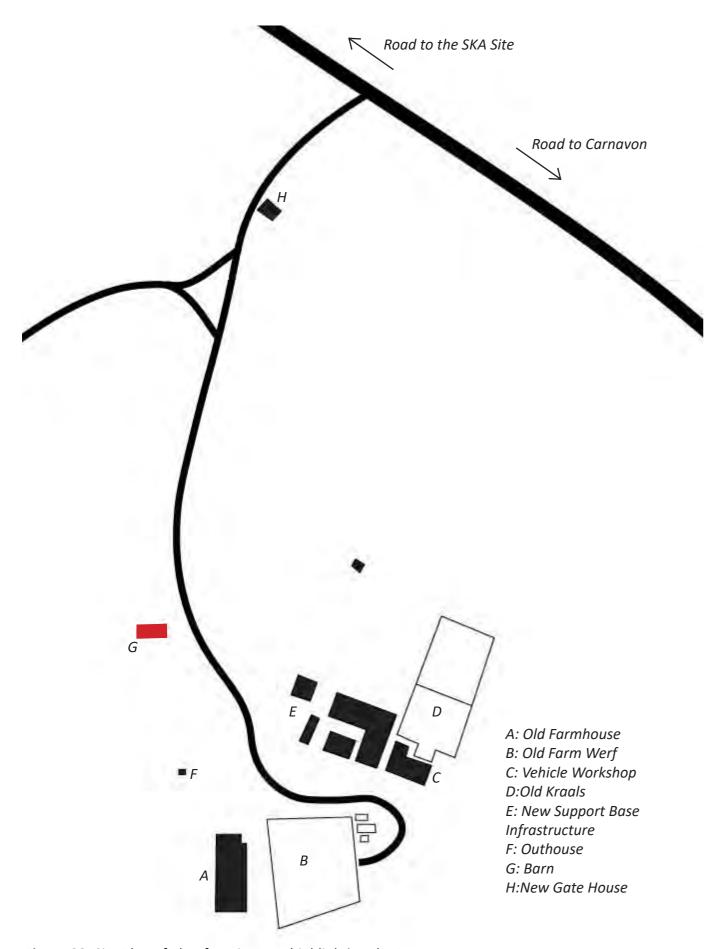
Site Plan of Klerefontein Farm highlighting the Barn
